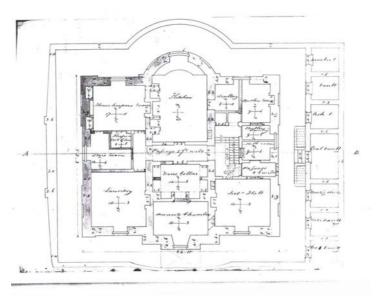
Ground plan including vaults of Hamilton's Castlehill House
